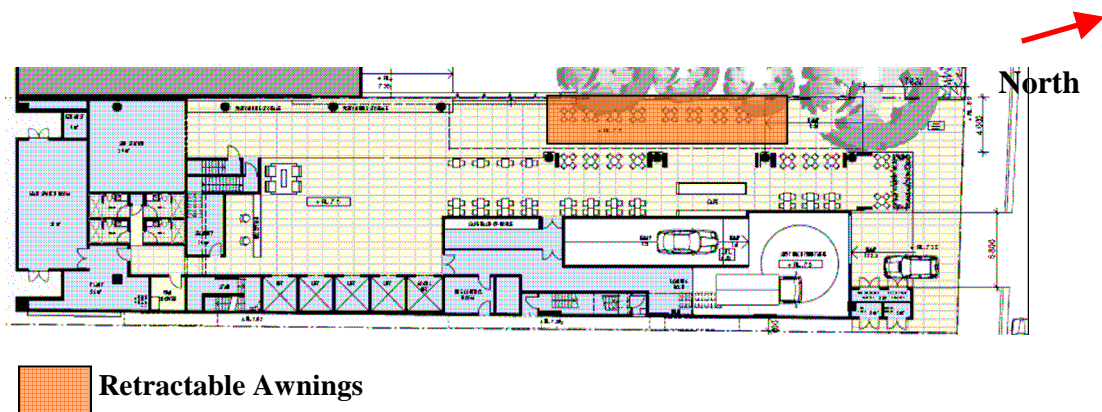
Schematic plan view of the proposed Development with the recommended wind control devices overlaid on the outdoor sitting area.
